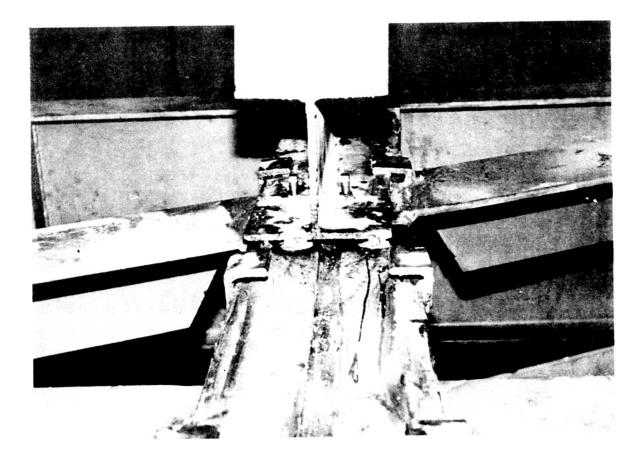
Typical Tack Weld Repair to Original Chocks (In many cases, weld did not penetrate greased skid beam)
